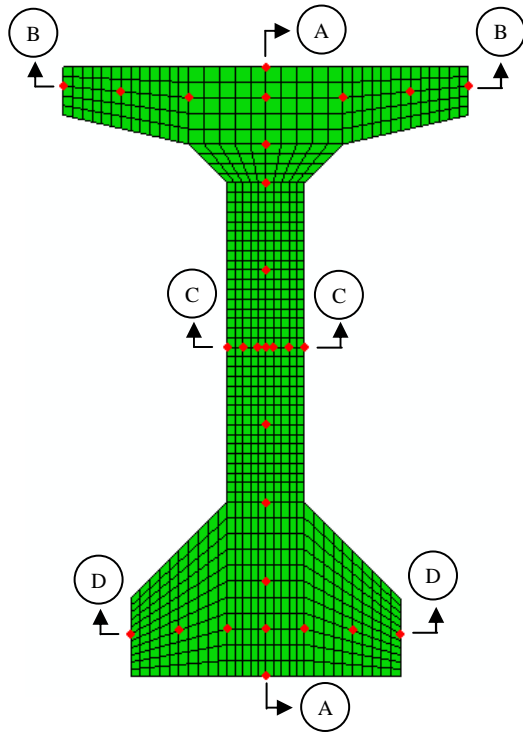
The cross-sections of the AASHTO-PCI standard girder sections.
